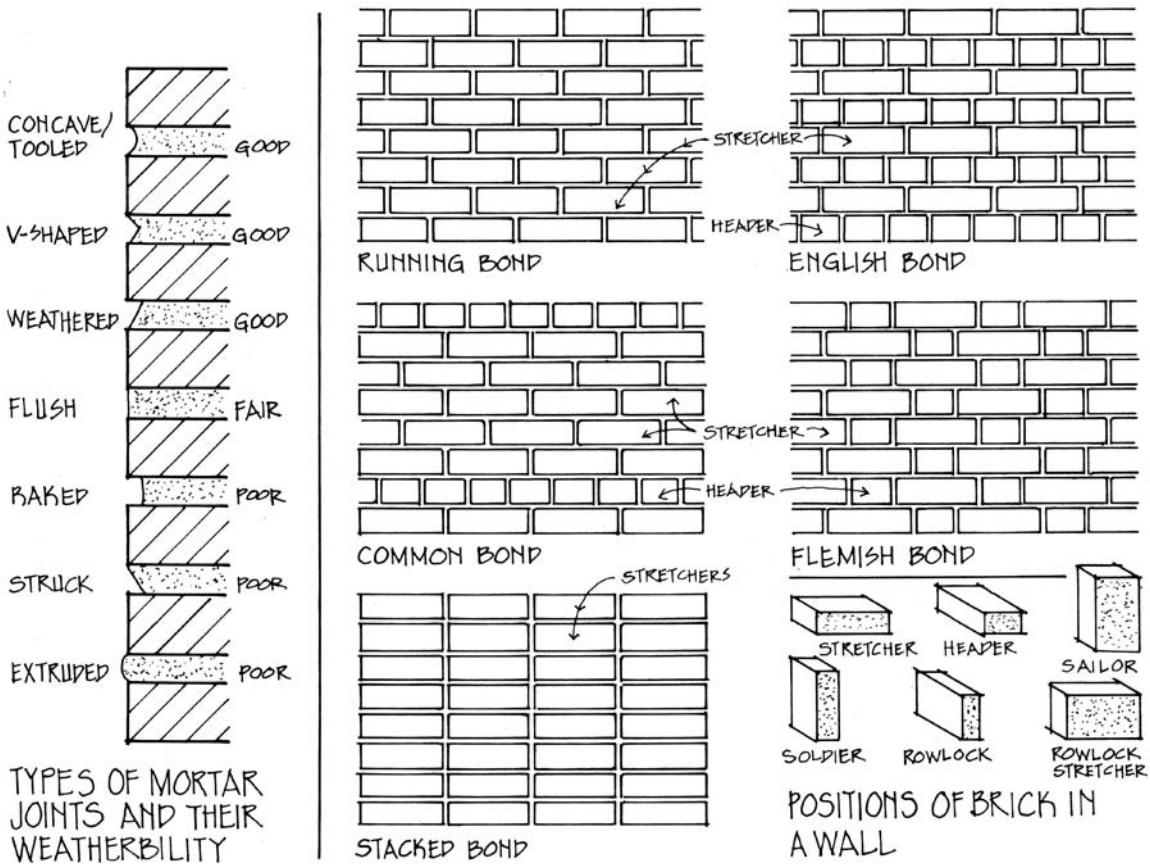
Common brick bonds and the names of brick positions used in a wall
